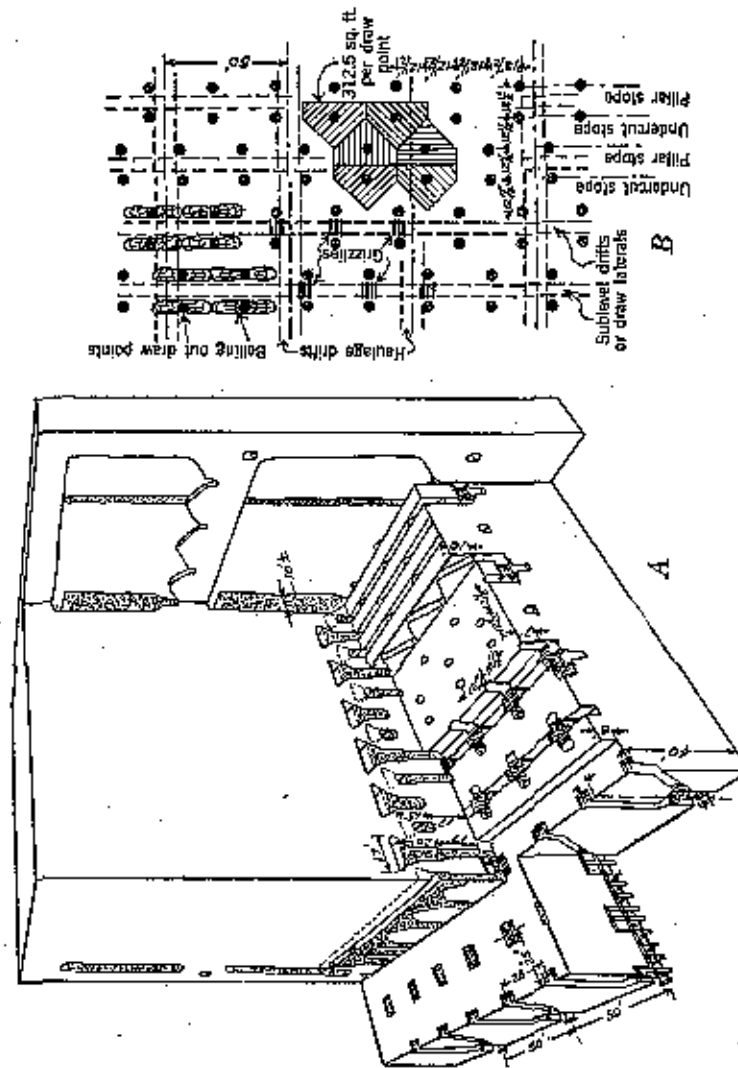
Sublevel undercut block-caving method at Ray mines, Arizona: A, General drawing of block; B, drawpoint spacing.
